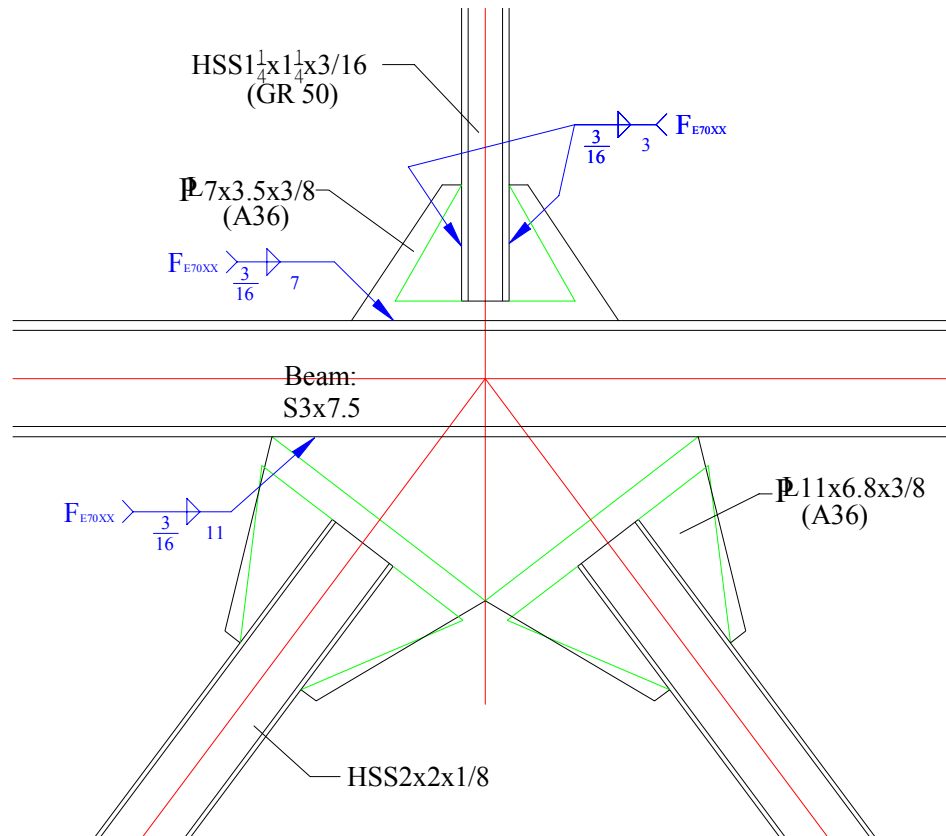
Details of the 2nd-floor brace-to-beam and zipper strut-to-beam connections.
